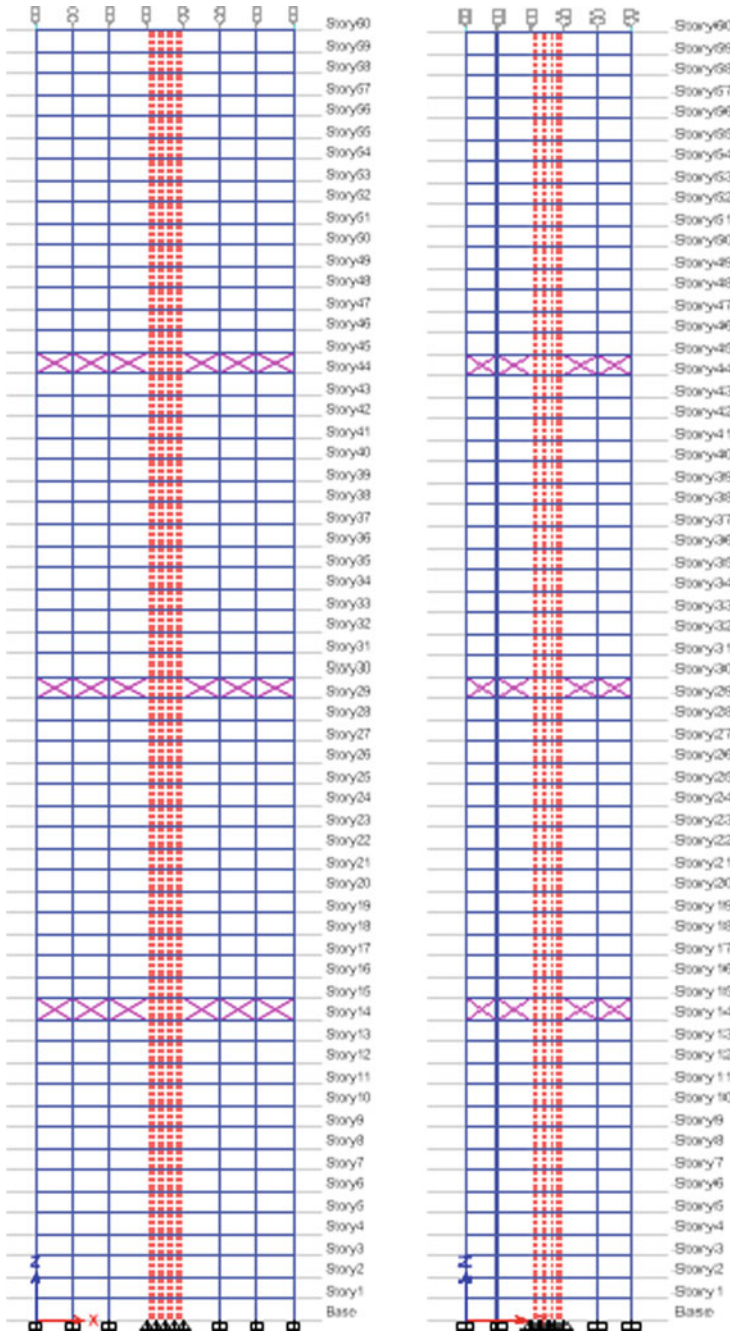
Elevation views of the building with core wall and triple outrigger with peripheral belt wall at 15th, 30th and 45th storey
